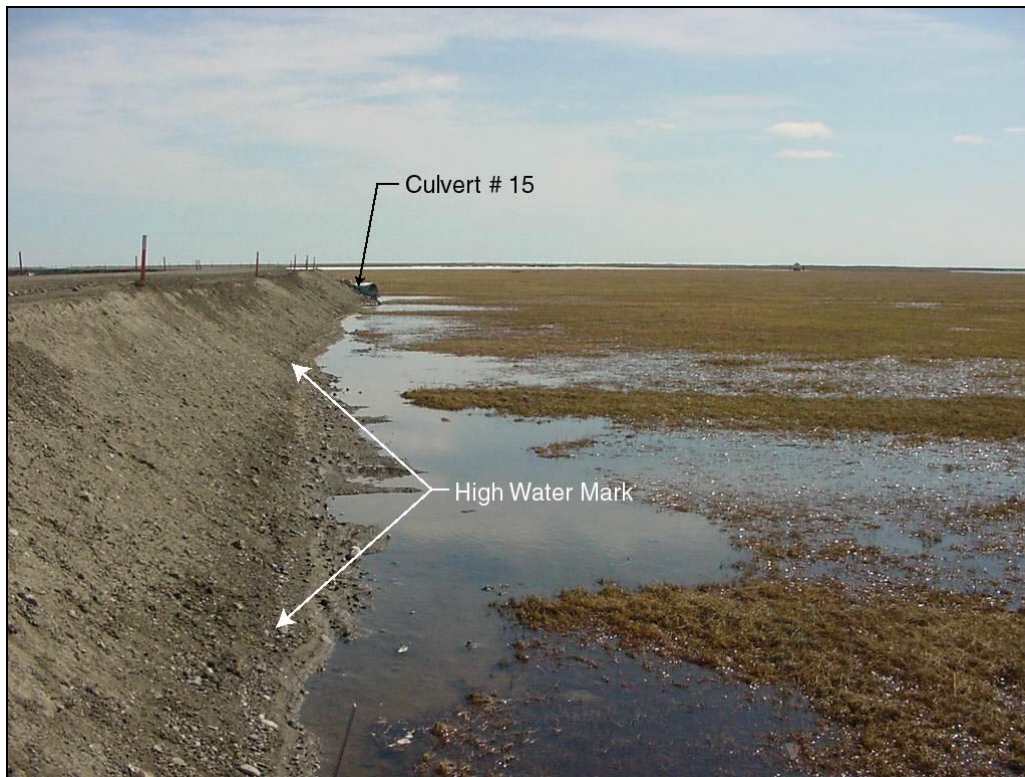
Facing east from Culvert #24 along the north side of the CD-2 access road. Photo taken June 16, 2001.
